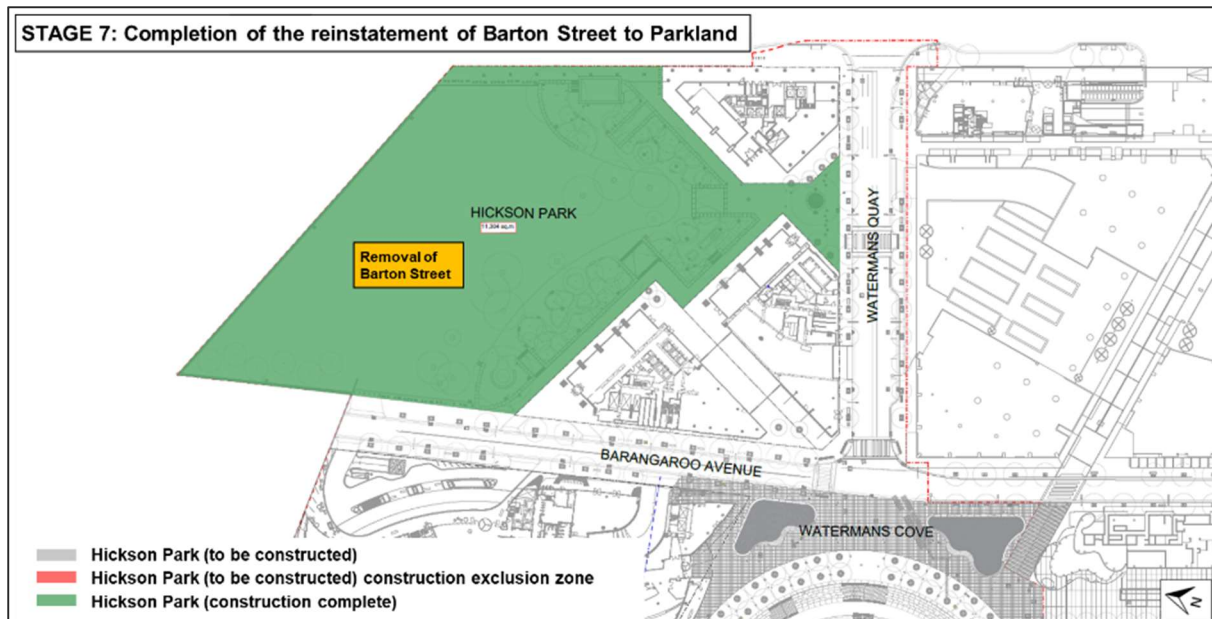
| Proposed Hickson park construction Stage 7 (final stage) (Base source: Proponent's EA)
